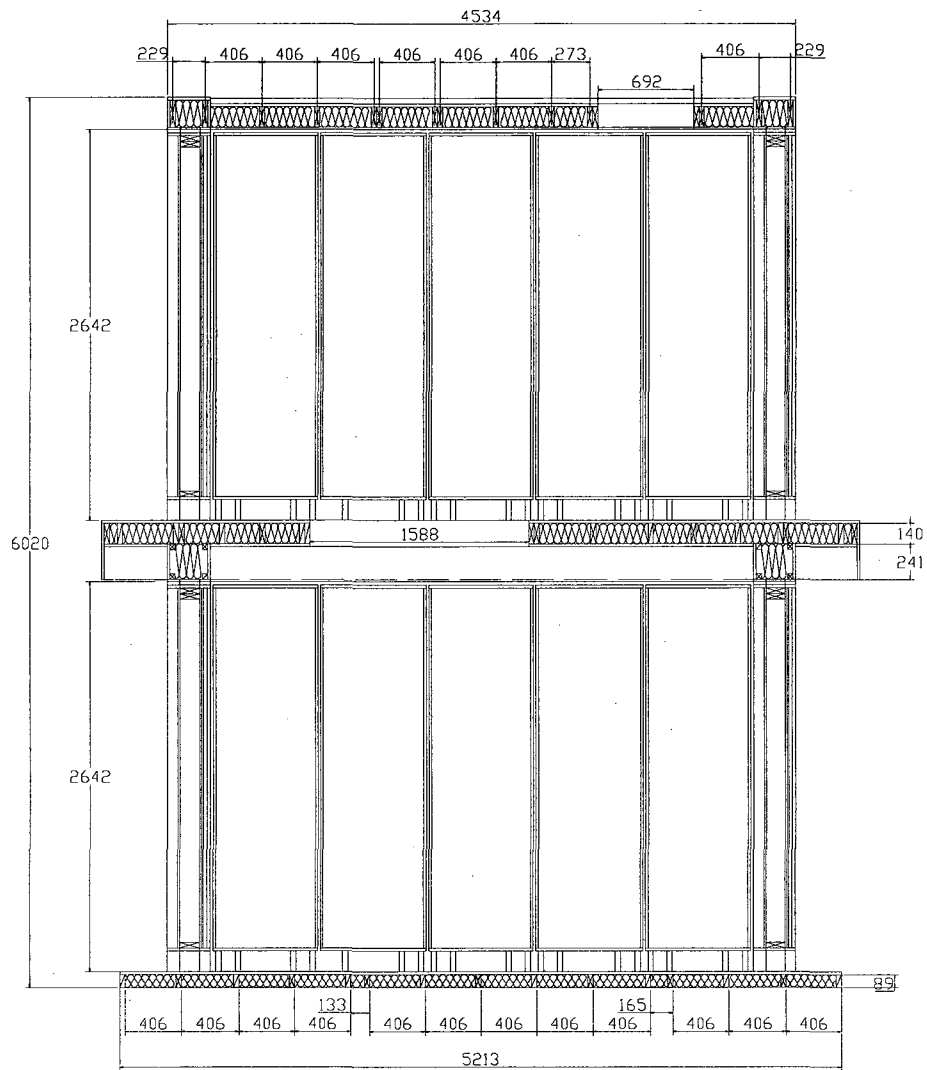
Vertical section of the test hut (Alturkistani et al. 2008)
